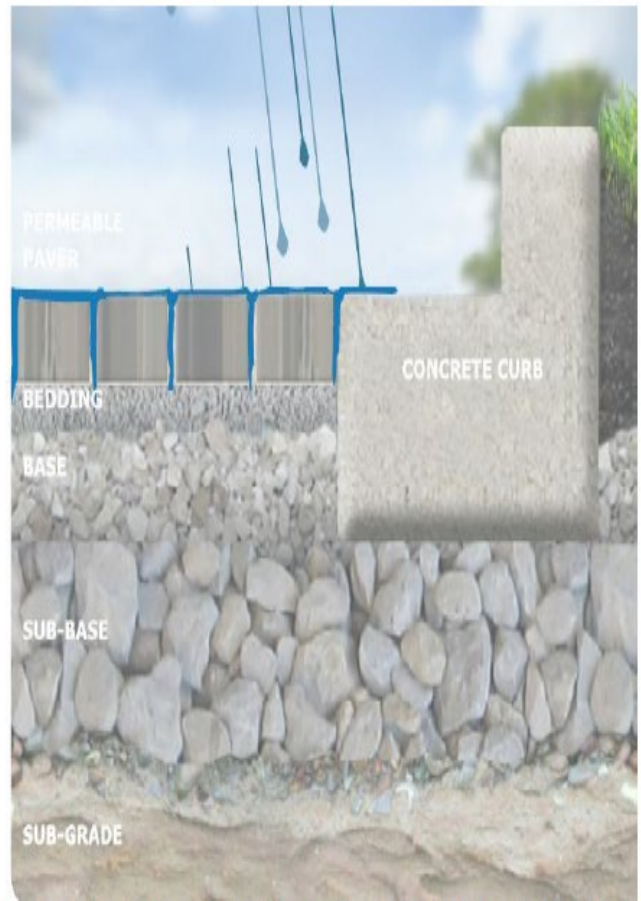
Example of a Permeable Paver Parking Lot Cross-Section (APT, 2011)
